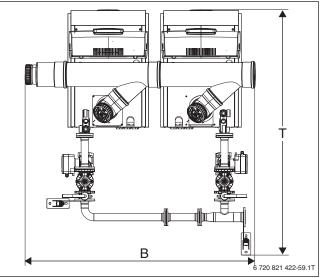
2-boiler cascade, installation side-by-side (dimensions → Table 30, page 79)
